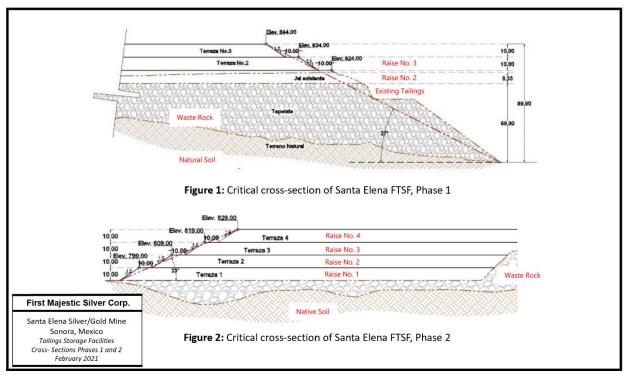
Tailings Storage Facilities Phases 1 and 2 Cross Sections
